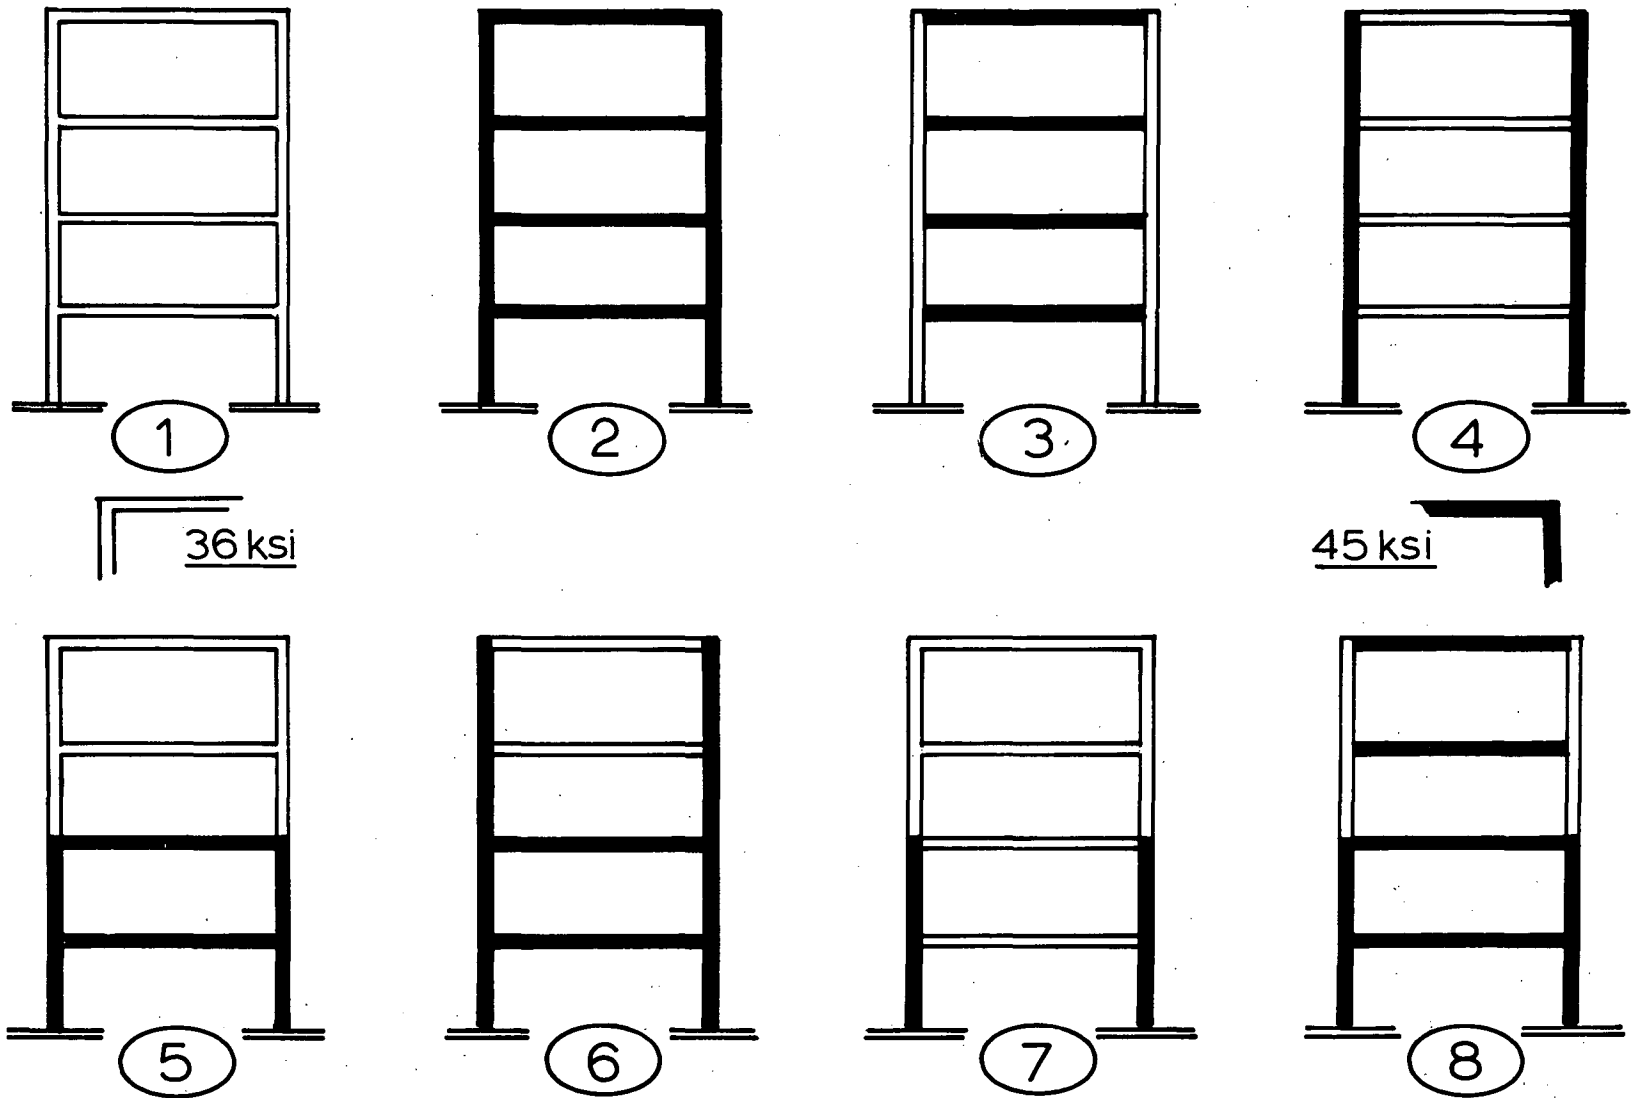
FRAME EXAMPLE WITH UNIT LOADING
